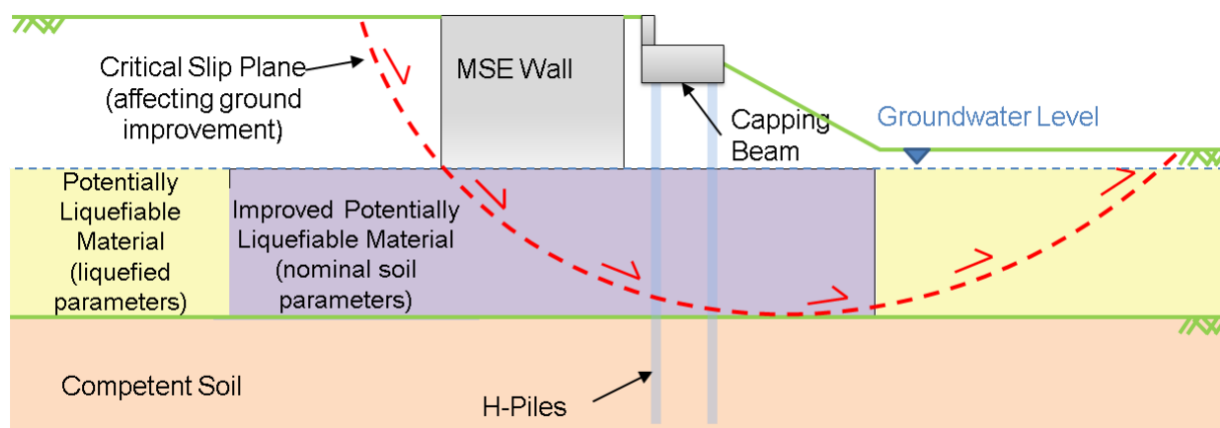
Ground Improvement of Liquefiable/ Compressible Materials
